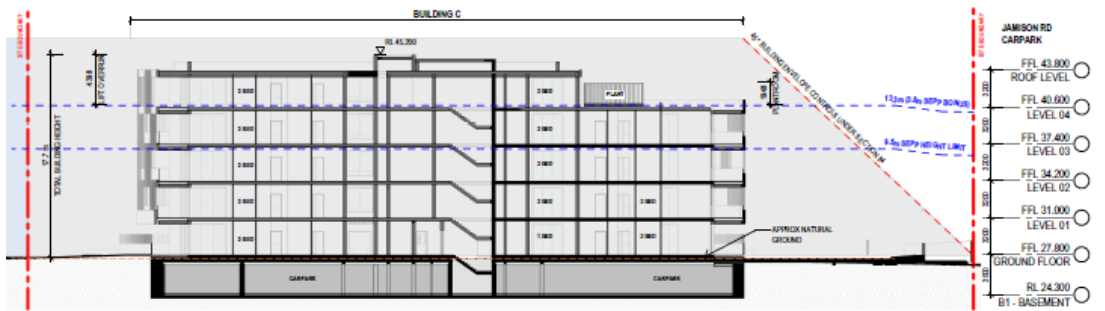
Proposed Building C Section 84 Building Envelope Compliance (Jackson Teece)
